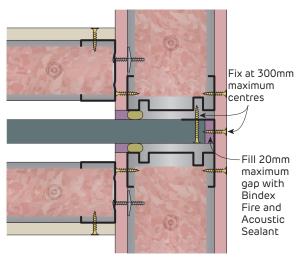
Wall End to Corridor Wall Improved Acoustic Detail - Steel angle Plan
